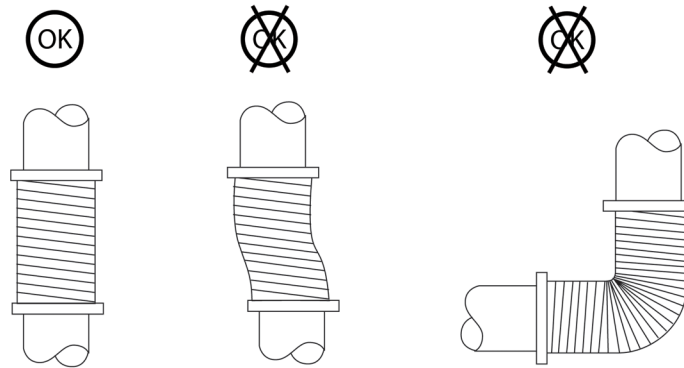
Flexible Connection “Metal Bellows” Installation
